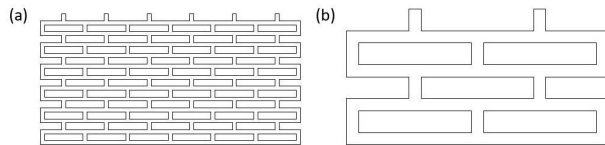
A plan view of cellular structures considered during the parametric study: a cell wall thickness of (a) 10 mm; (b) 30 mm.
